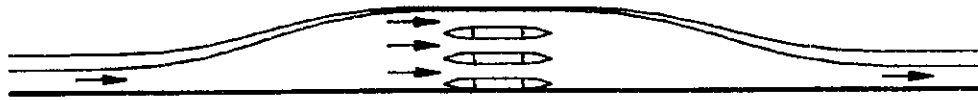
Typical Layout of Tollgate on Ramp Way
